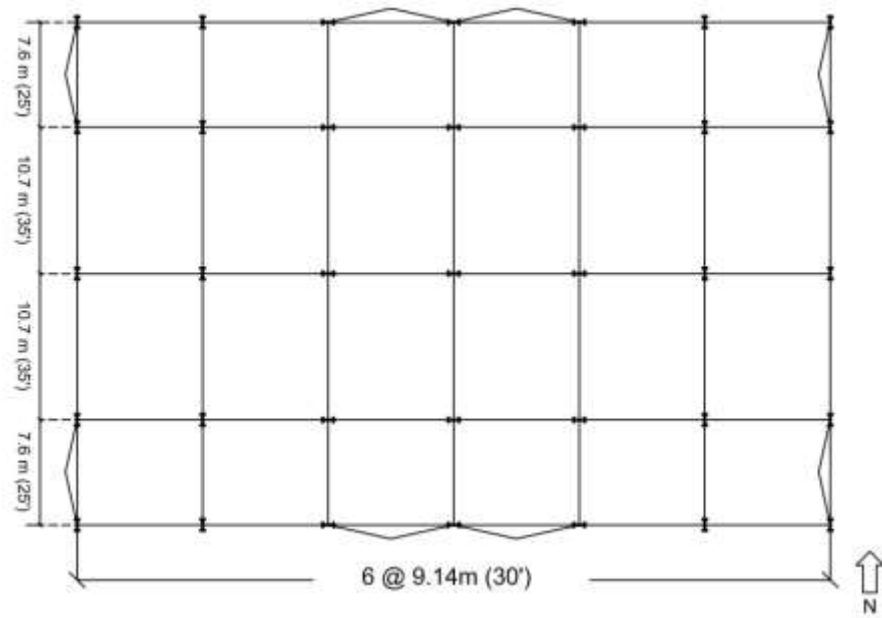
Floor plan of 3-story eccentrically braced frame buildings for CEBF-D type
